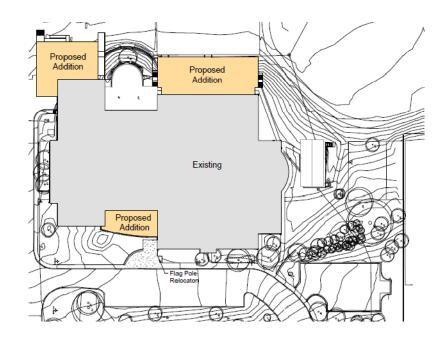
Site Plan of Amanda Arnold Elementary for Proposed Renovations Plan provided by Anderson Knight Architects (Anderson, Tracy, 2010).
